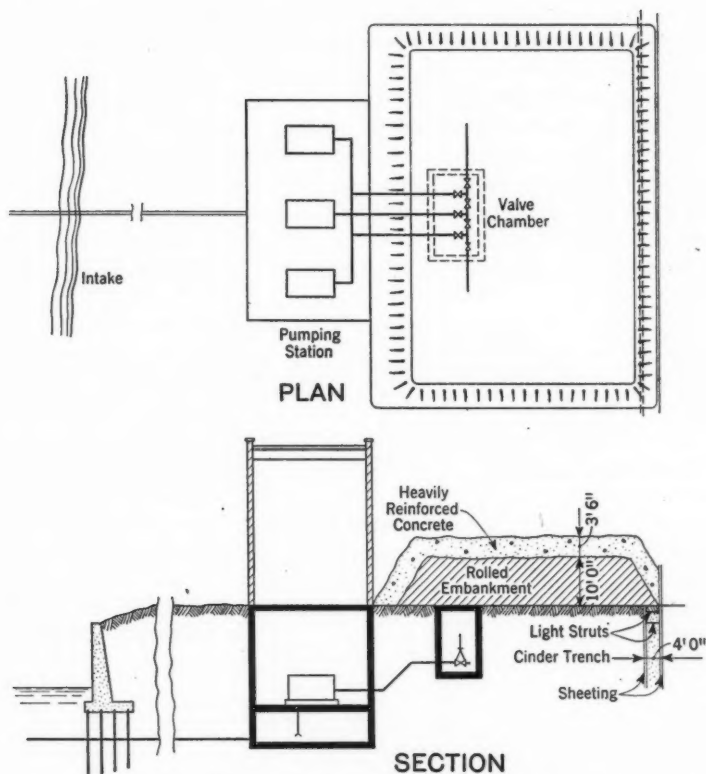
PROTECTIVE COVERING OF SUBSURFACE STRUCTURE
